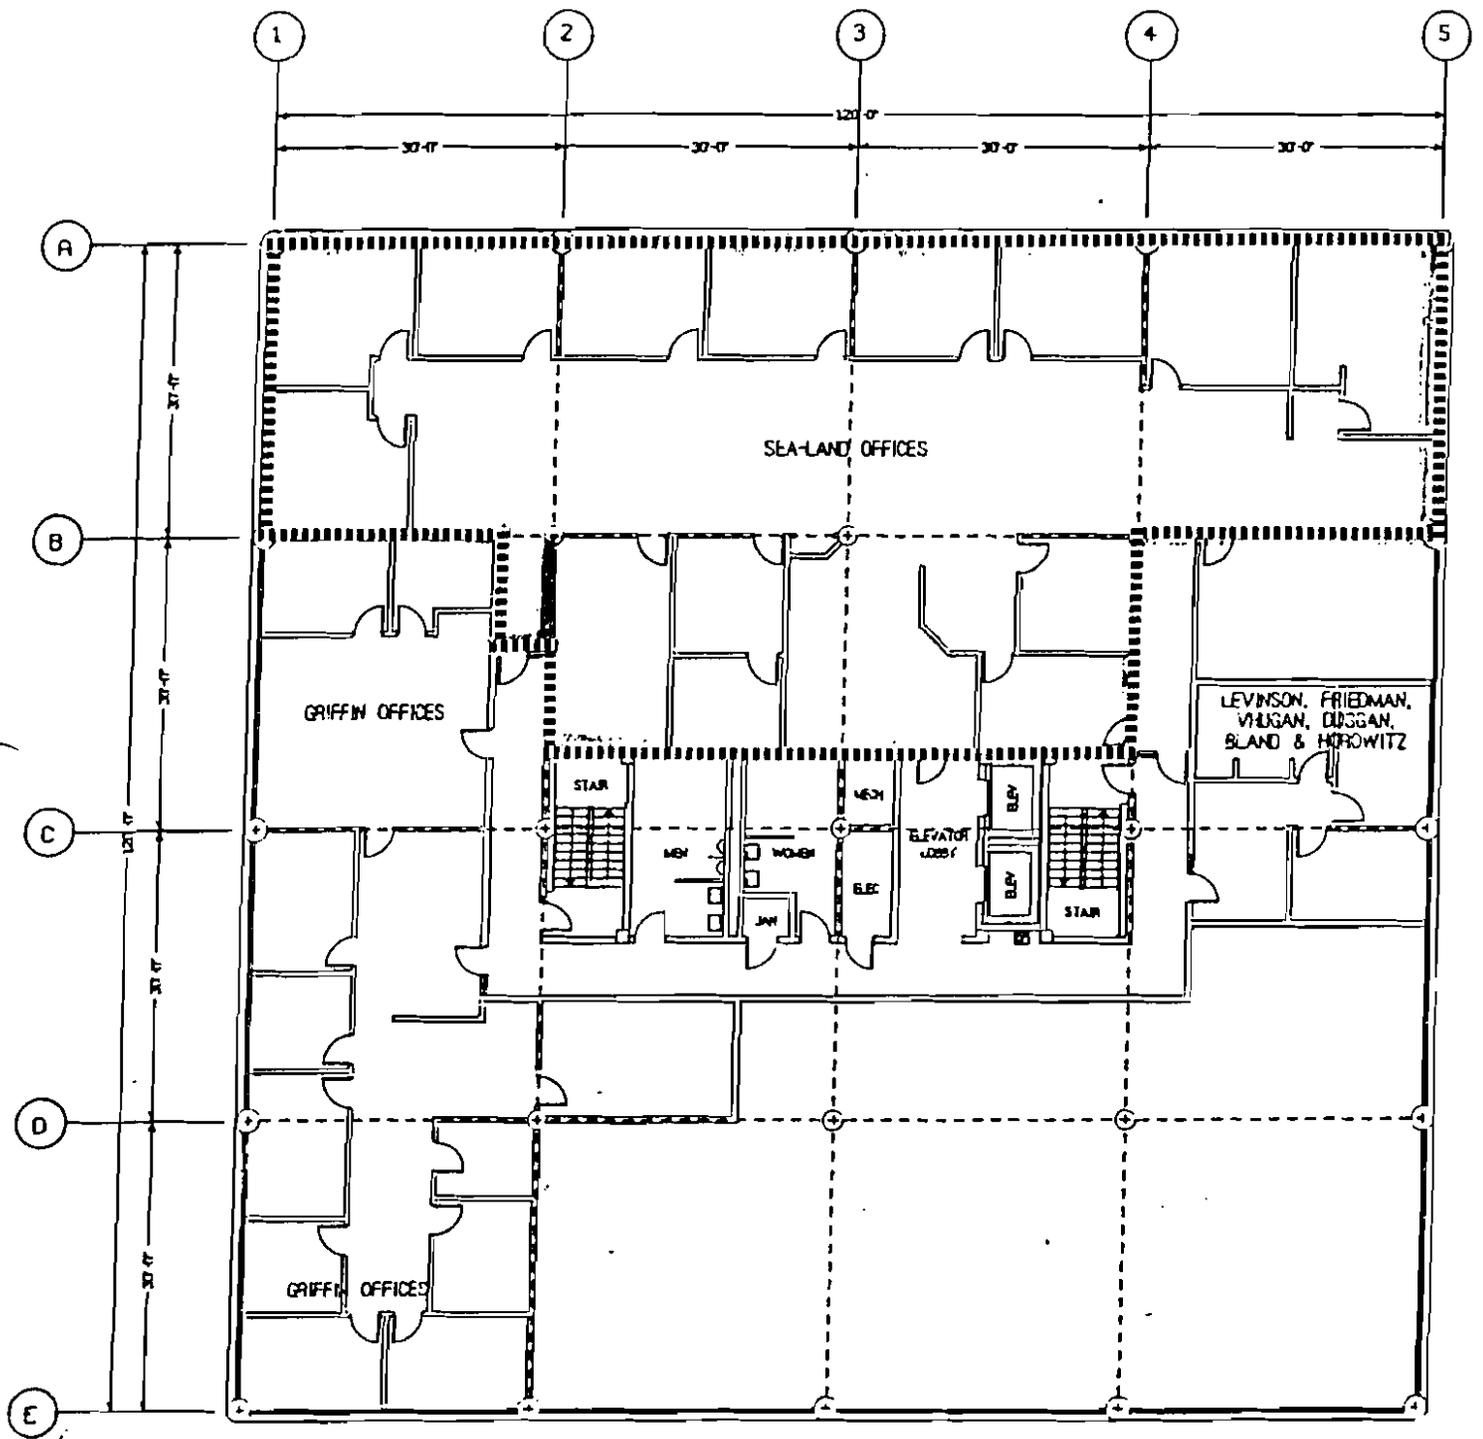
EXHIBIT "A"(Page 2): World Trade Center - 5th Floor
